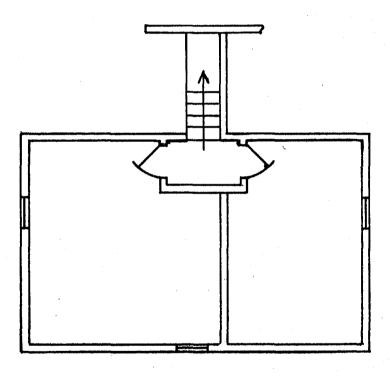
PLAN OF THE SECOND FLOOR AFTER REMODELING
